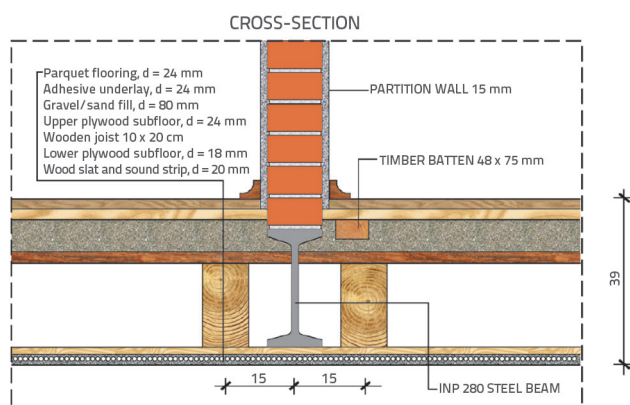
Cross-section of a floor structure with timber joists and steel profiles
